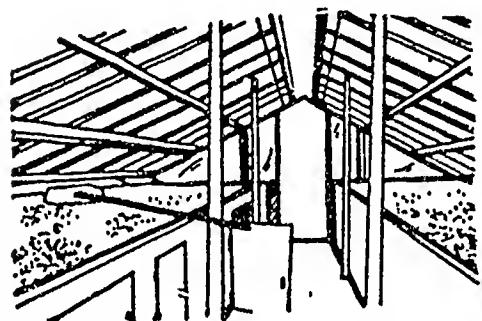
Plastic-covered, walk-through solar coffee dryer, Columbia
